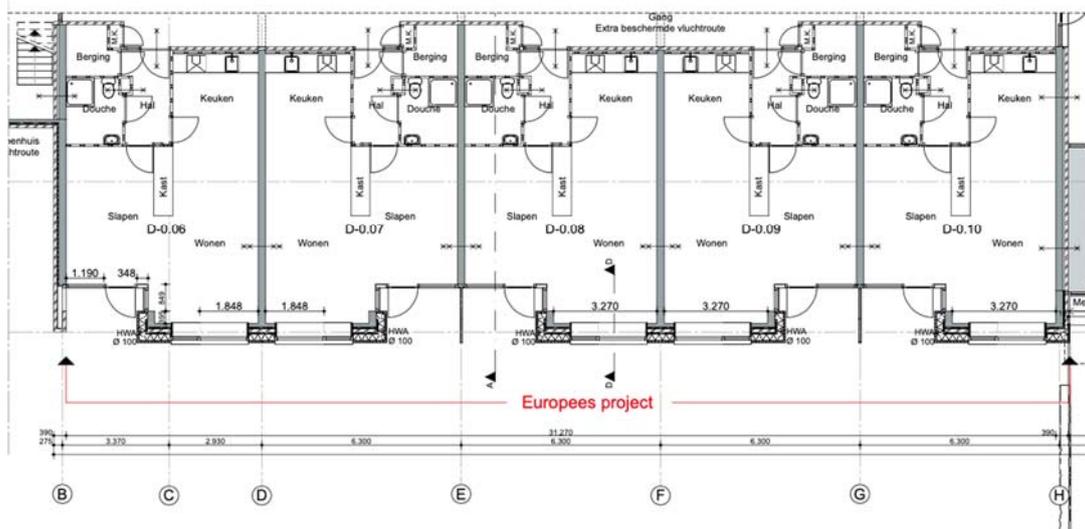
North East floor plan of the 4RinEU demo façade renovation in Mariënheuvél, Soest
